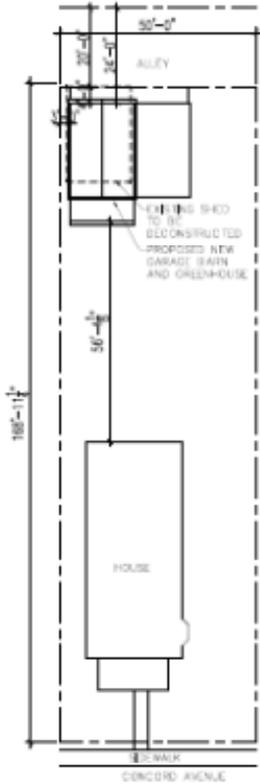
Site Plan - proposed demolition (hatched line) and proposed at north end of property, 611 Concord Ave
